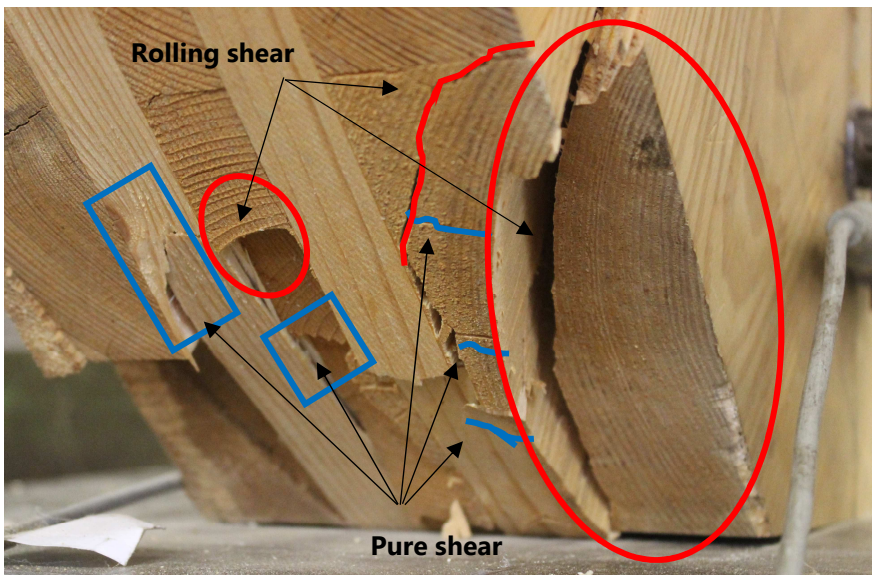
failure paths at the end of the shear test, the bottom side of specimen S-15.
